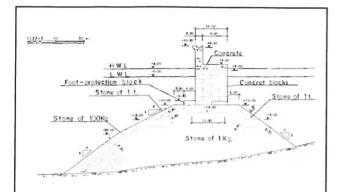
Cross-section, Santa Cruz de la Palma Breakwater, Spain (Ligteringen 1996).
